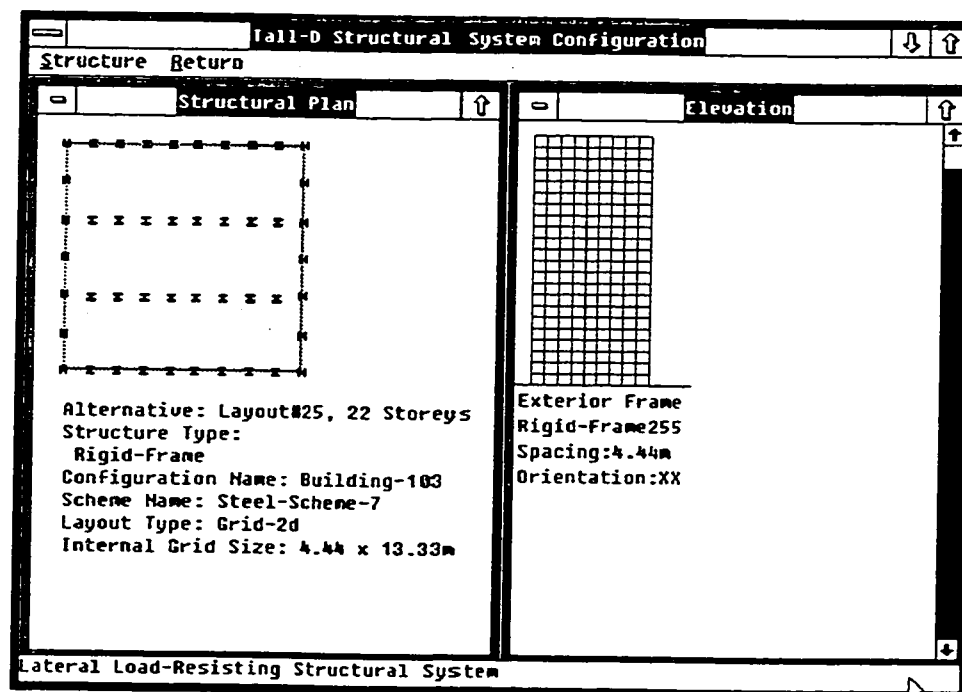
(m) Rigid frame structural system alternative for Layout#25: Uniform column Grid 4.44 x 13.33m.
